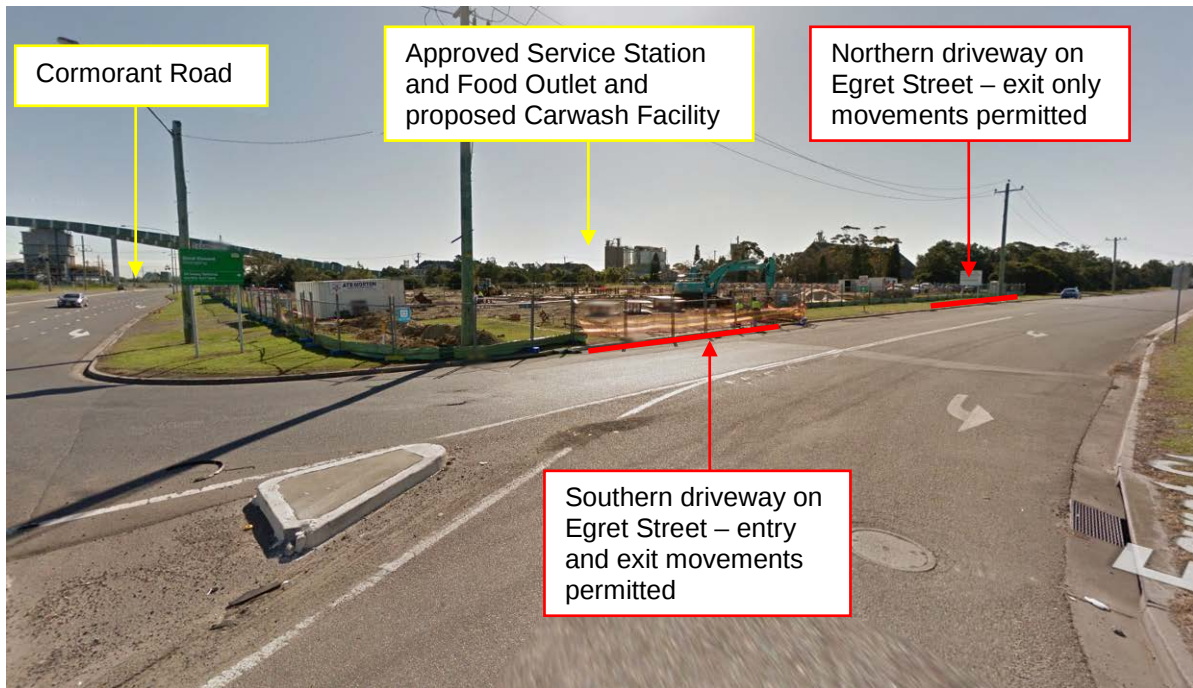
Access arrangements on Egret Street looking north (Source: Google maps)
